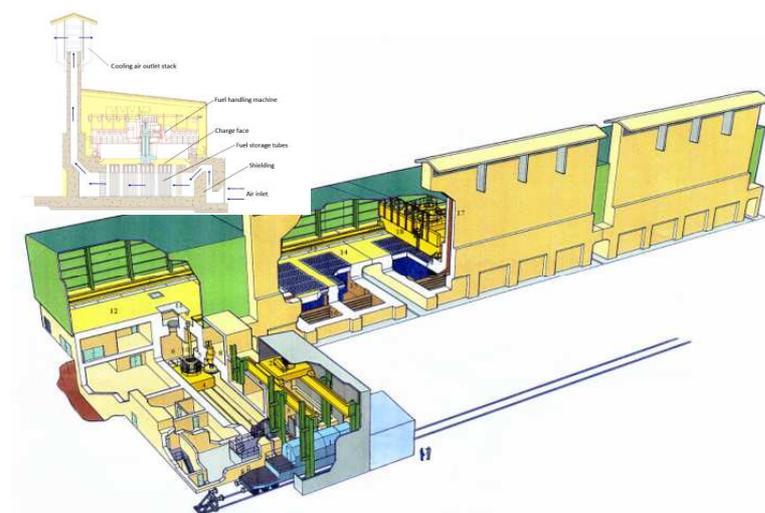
Cutaway view of the MVDS (Modular Vault Dry Store) concept
